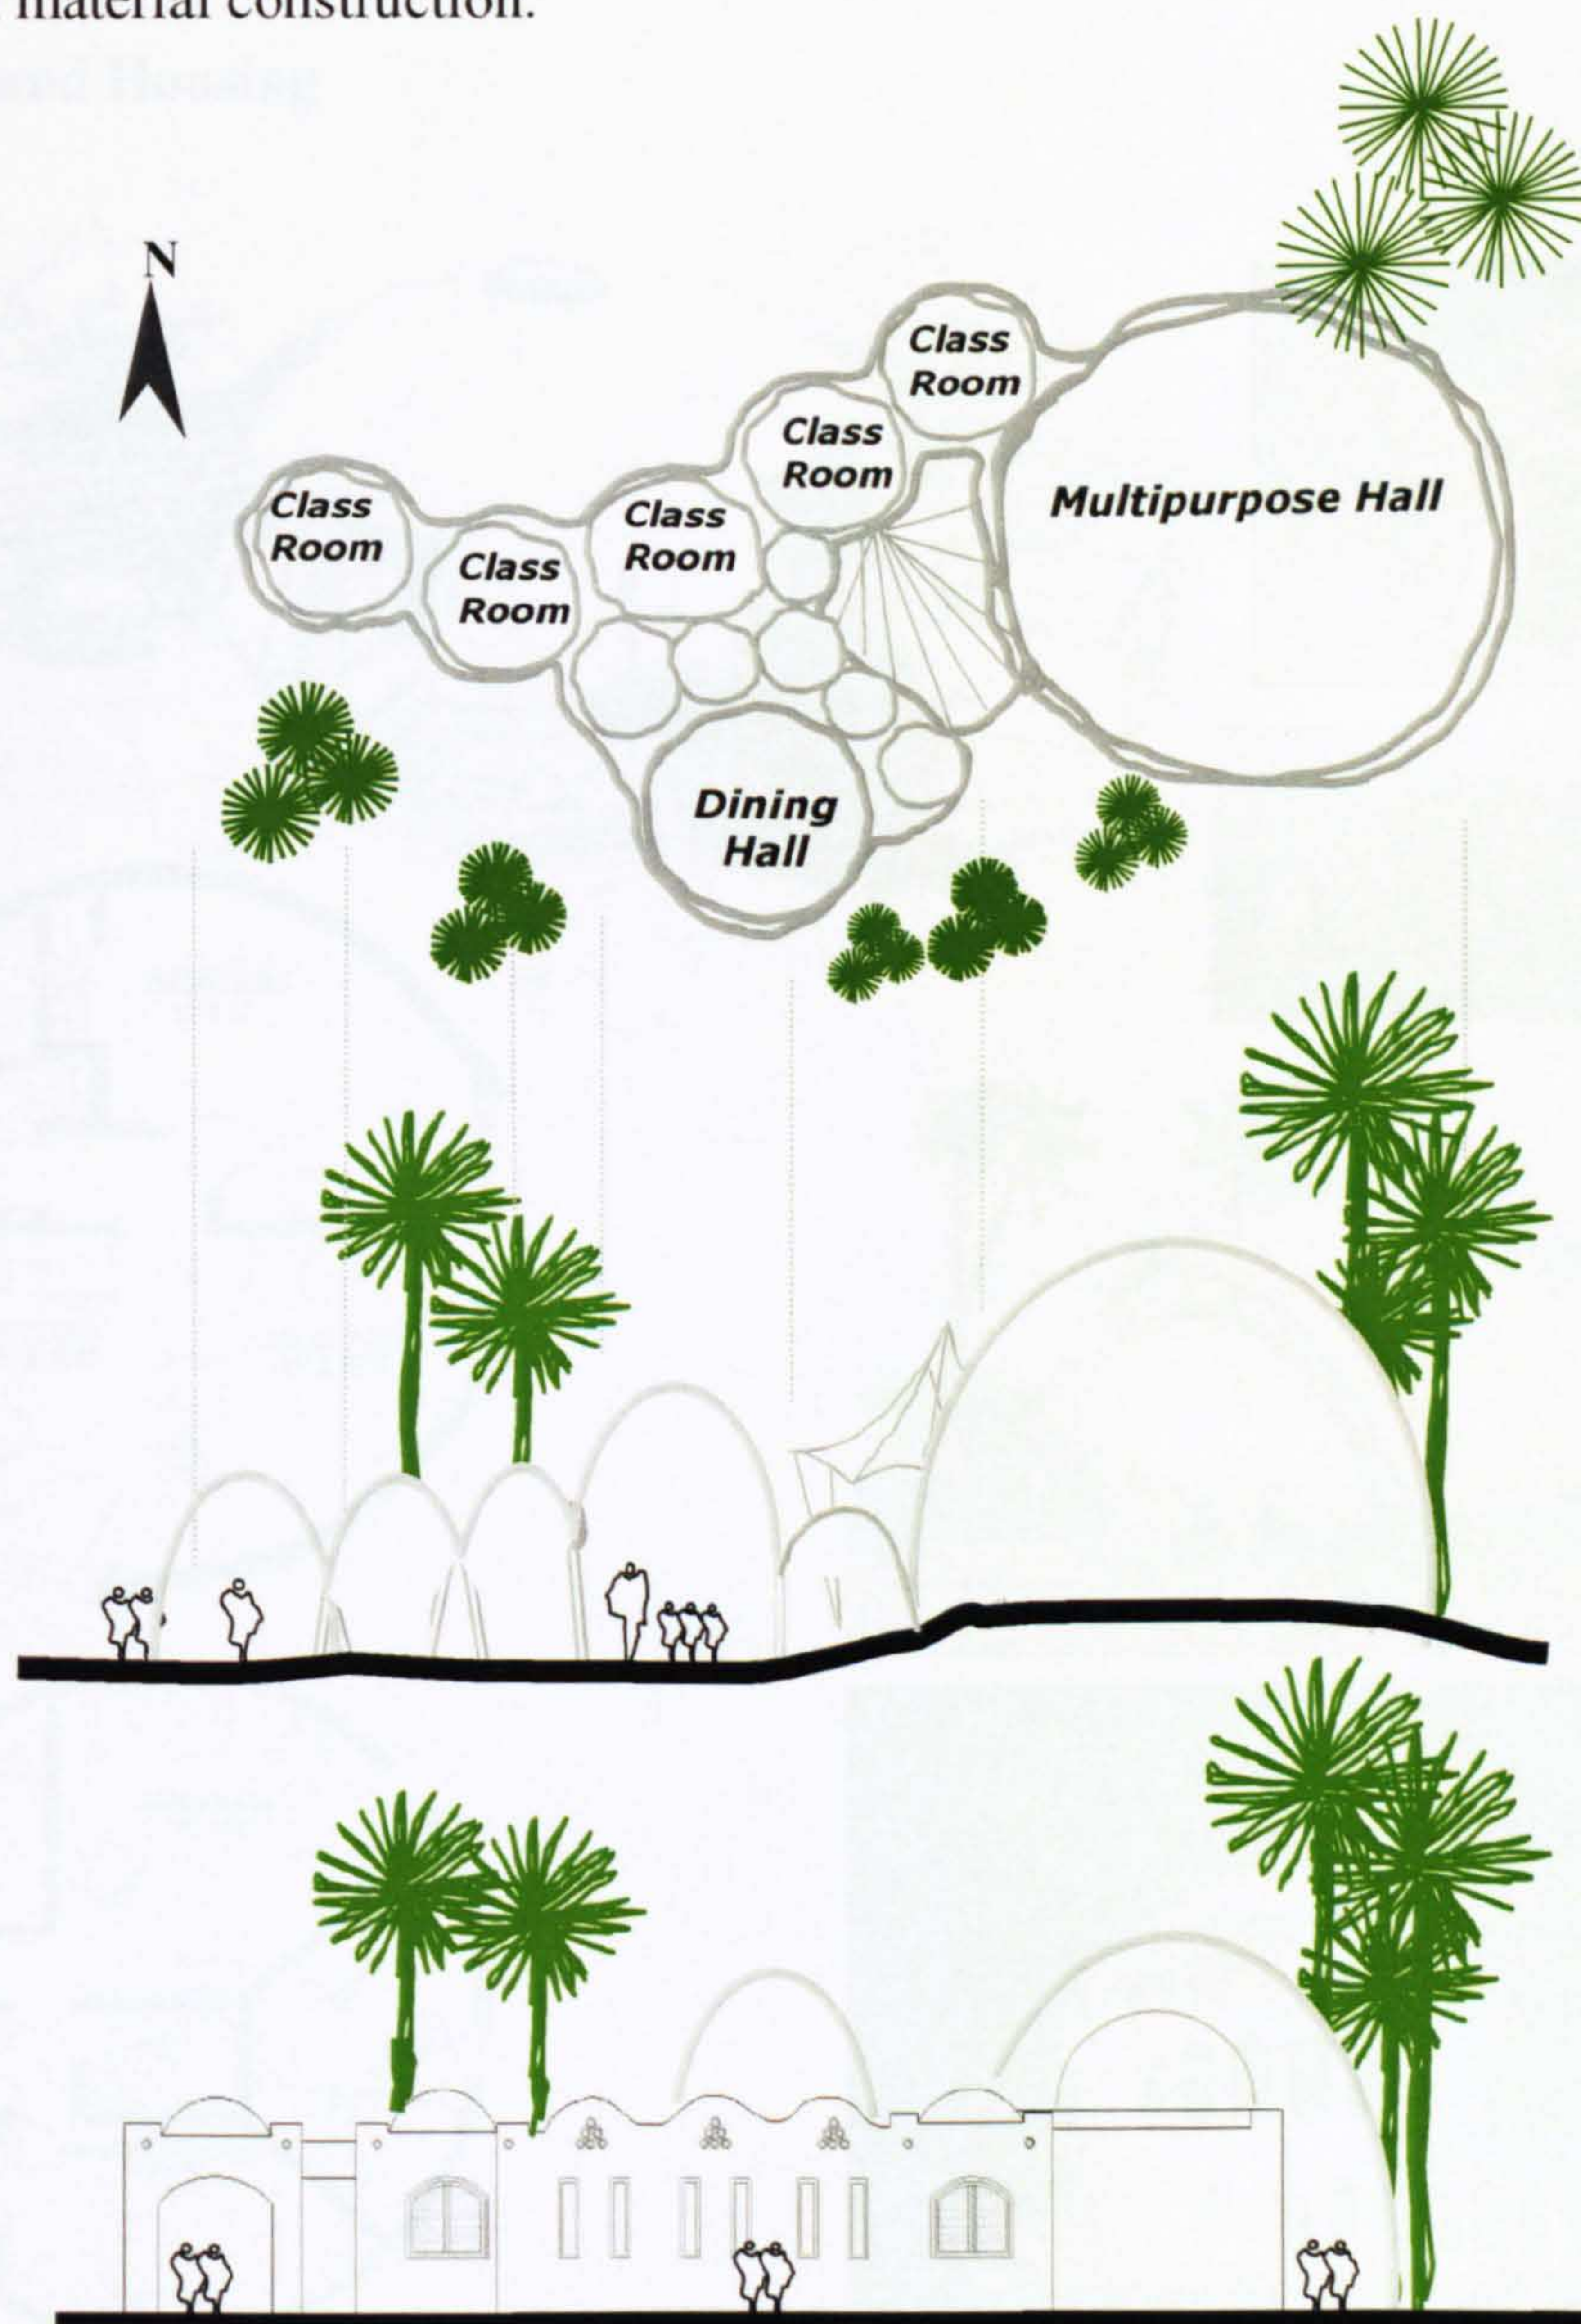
Plan, Section and Elevation of an Architectural Proposal for a Nursery, Primary School, or Multicultural Community Centre
